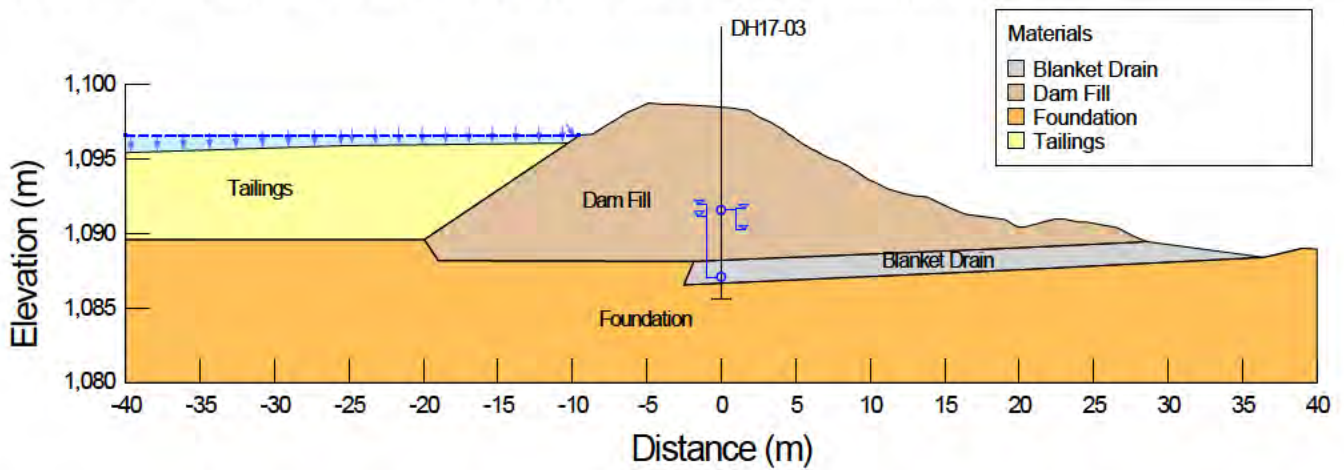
Southeast Dam at DH17-03, As-built, 2017 Condition (New Datum)
